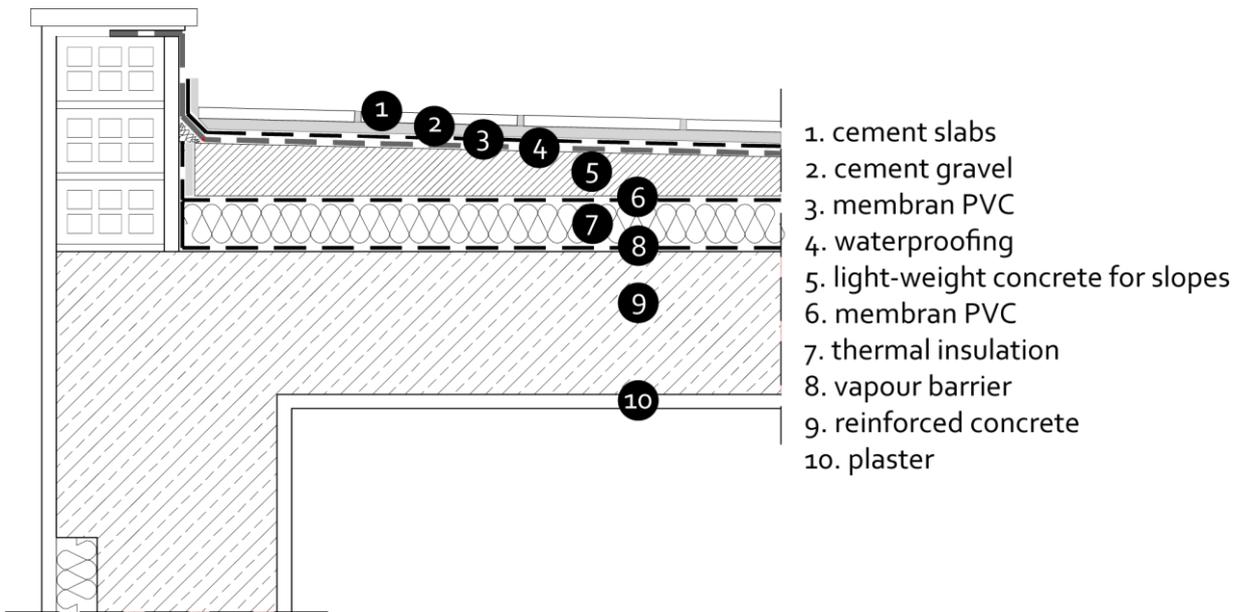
Common practice flat roofs - Buildings like MF4 (161)
